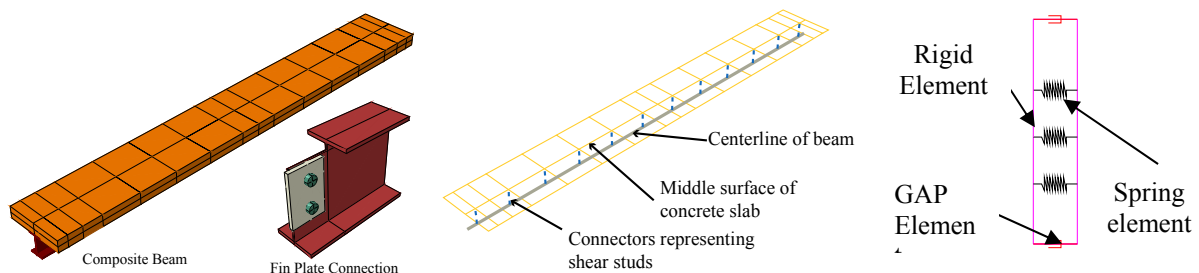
(a) Composite beam & fin-plate connection of a beam; and mechanical idealization of (b) composite beam and (c) fin plate connections
